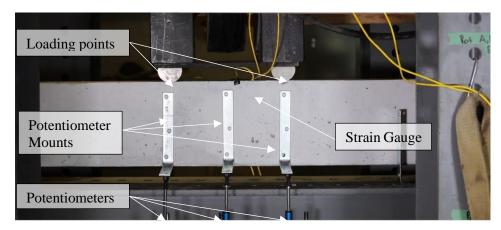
Beam Instrumentation Overview (shown within Test Frame) Note: Longitudinal steel and concrete mounted strain gauges (far size of the beam) not visible
